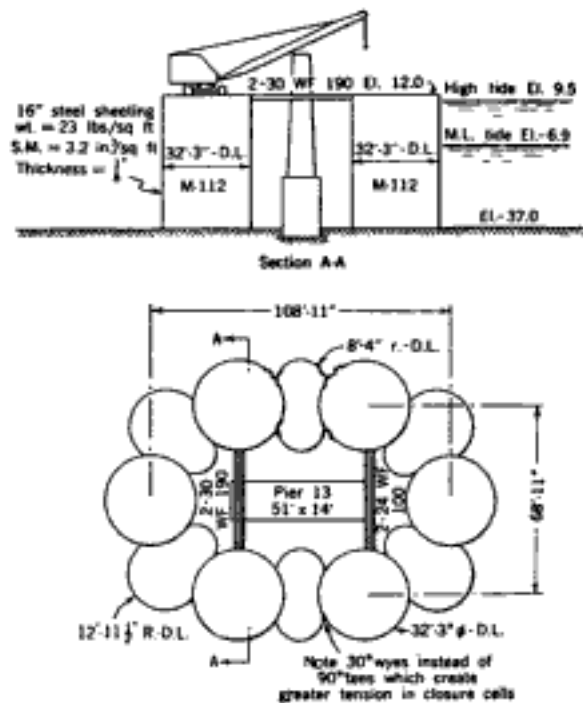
Circular cell cofferdam complex with horizontal bracing, Bangor-Brewer Bridge, Bangor, Maine, USA (White¹⁹)
